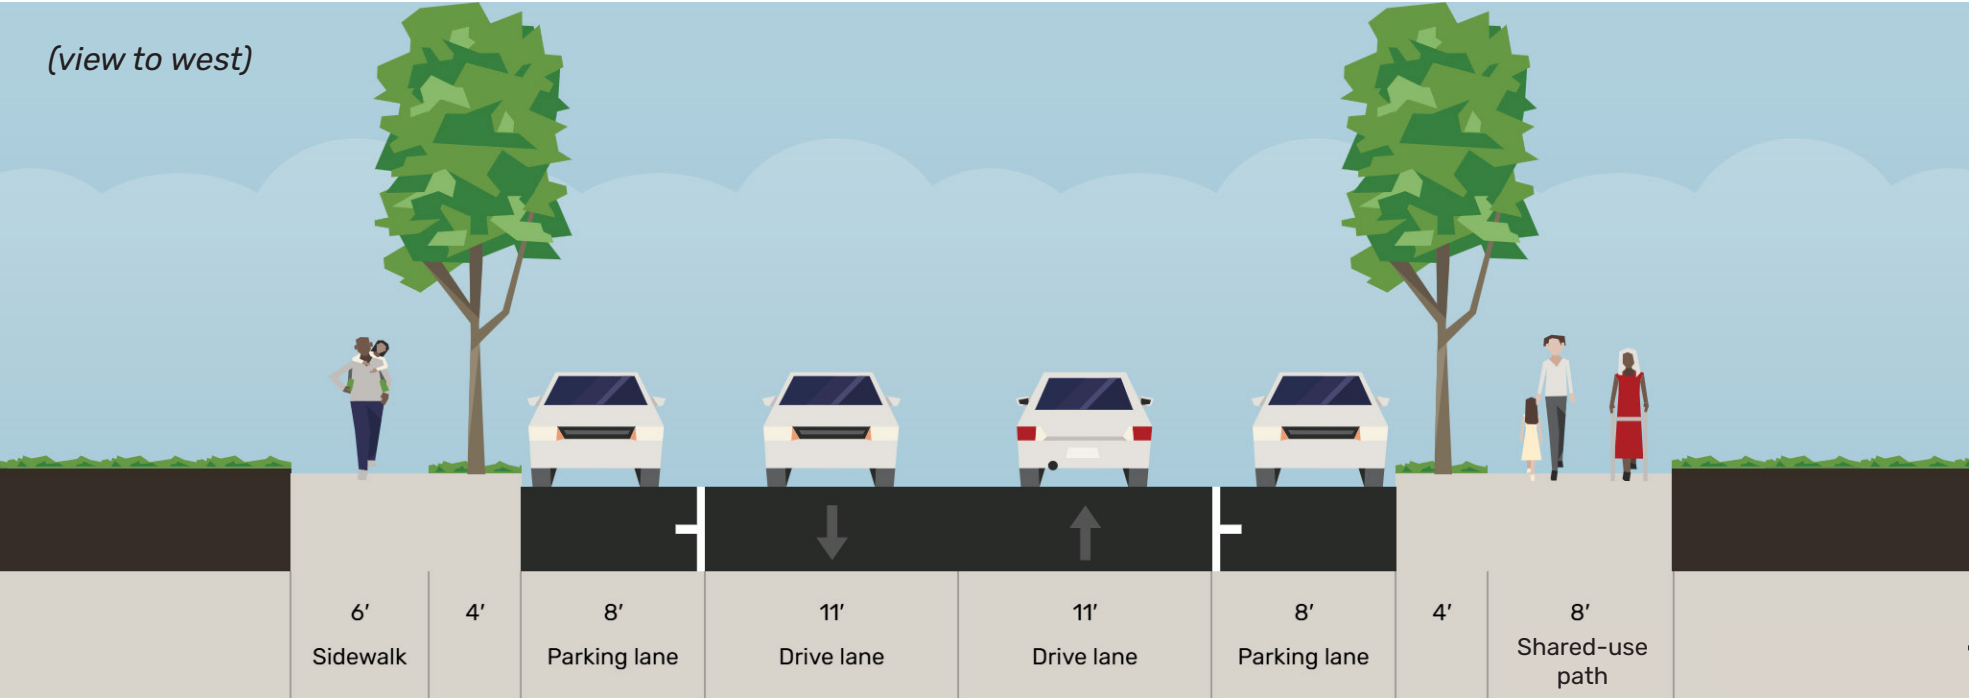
Proposed Typical Cross-Section on Silver Meadow Lane (60' ROW)
